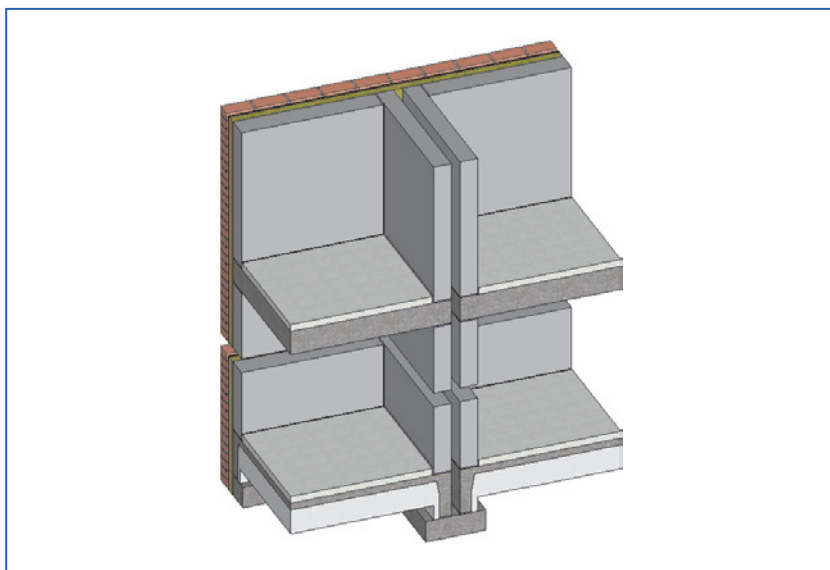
Ground floor, and first floor details of a Dutch cavity wall in terraced houses since 1975. Since 1992 mostly with an acoustical layer between foundation and ground floor.
